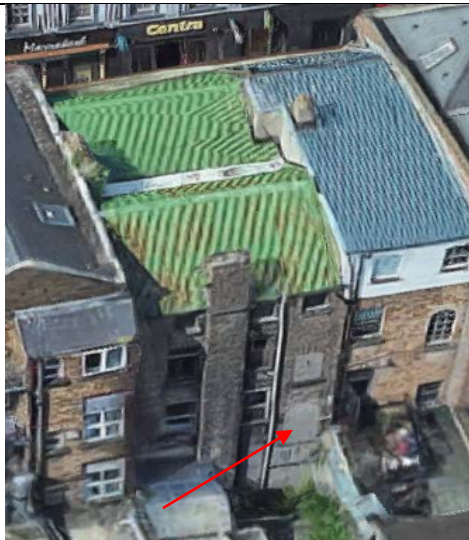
Rear elevation with blocked round-headed opening arrowed red to No. 46
